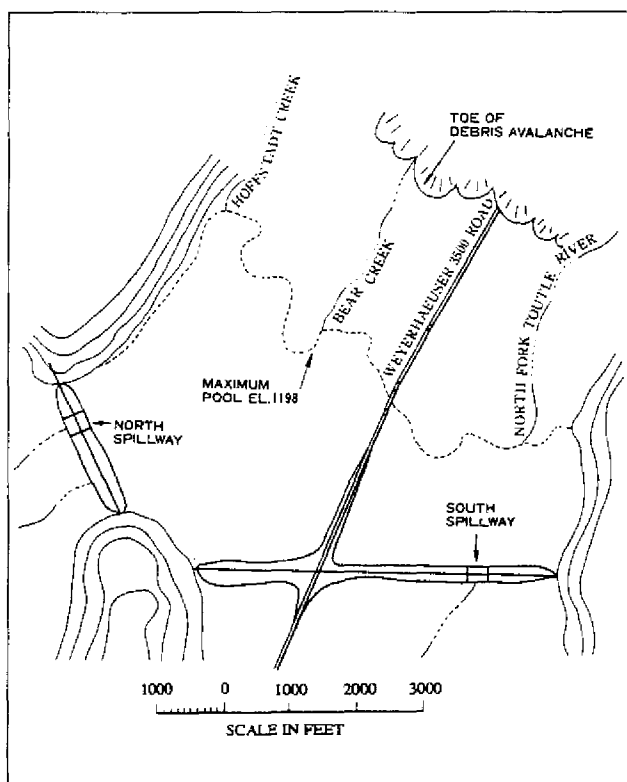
Mt. St. Helens: Site plan of debris-retaining dams.
